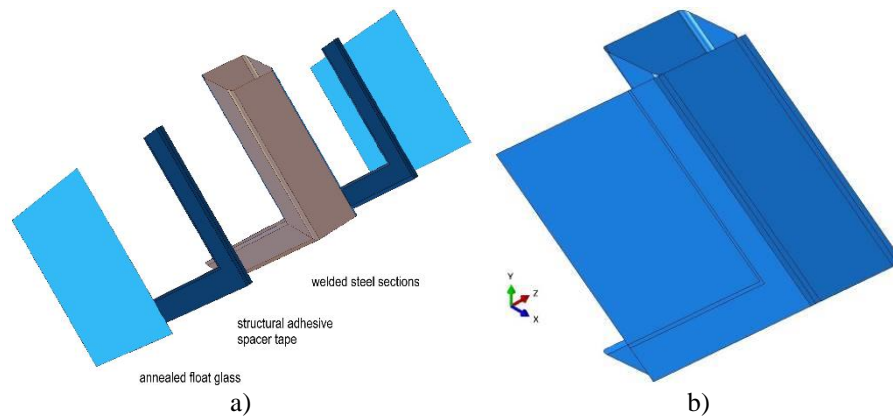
a) Exploded view and b) assembly for the numerical model to investigate the rotational stiffness of welded steel corner configurations stiffened with two-sided bonded glass panes.
